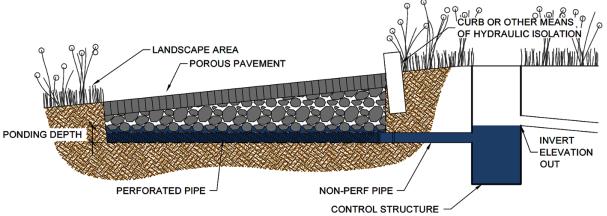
When a perforated pipe is placed at the bottom of a porous pavement, a control structure is required to ensure that the desired volume of water backs up into the pavement and infiltrates. CAUTION: Raising the pipe elevation instead of using a control structure to achieve adequate storage could provide the desired storage for infiltration but could also damage the pipe, as result of not being buried deep enough to be protected from vehicular or maintenance equipment.
